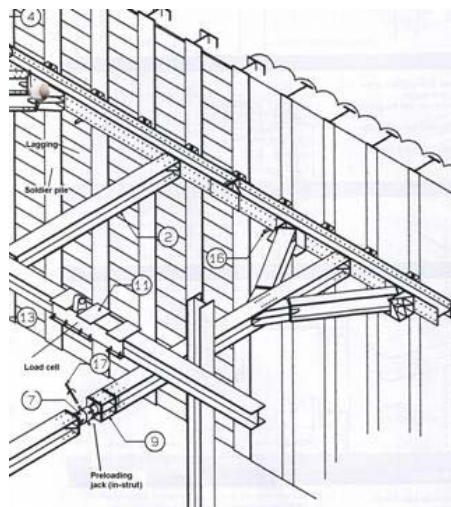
Preloading jack (in-strut), strut load cell (Hirose, c.1996).
